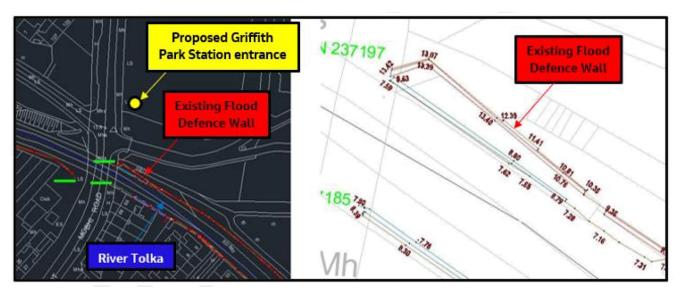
Location of the existing Flood Defence Wall north to River Tolka (Ch. 13 + 875) and top of wall levels.
